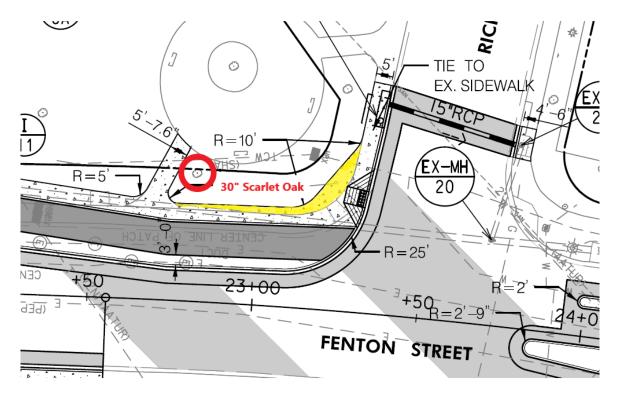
Proposed pavement beyond existing limits to be removed to avoid impacts to the 30-inch scarlet oak at the corner of Fenton Street and Richmond Avenue
